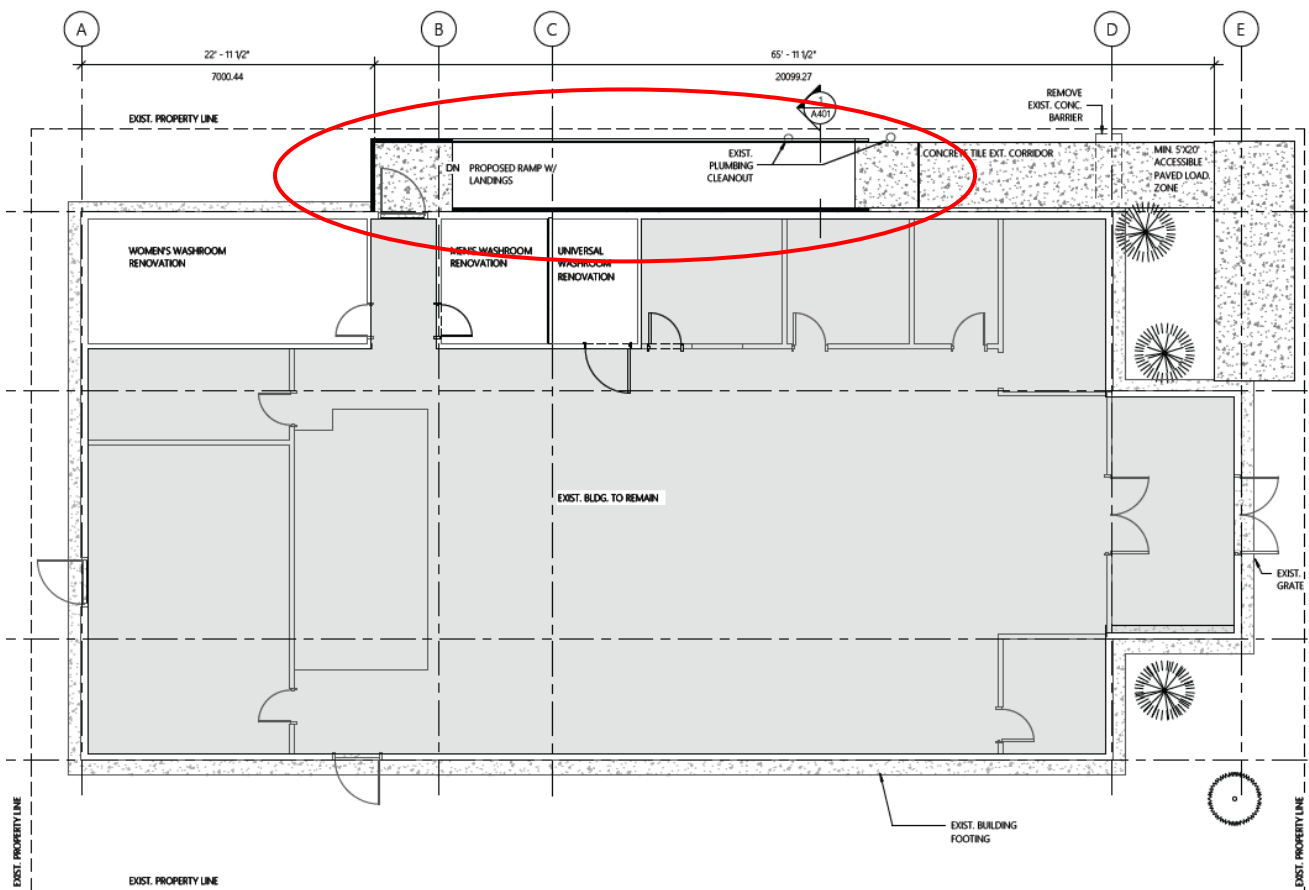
Site plan/floor plan with the proposed emergency exit ramp circled red.
